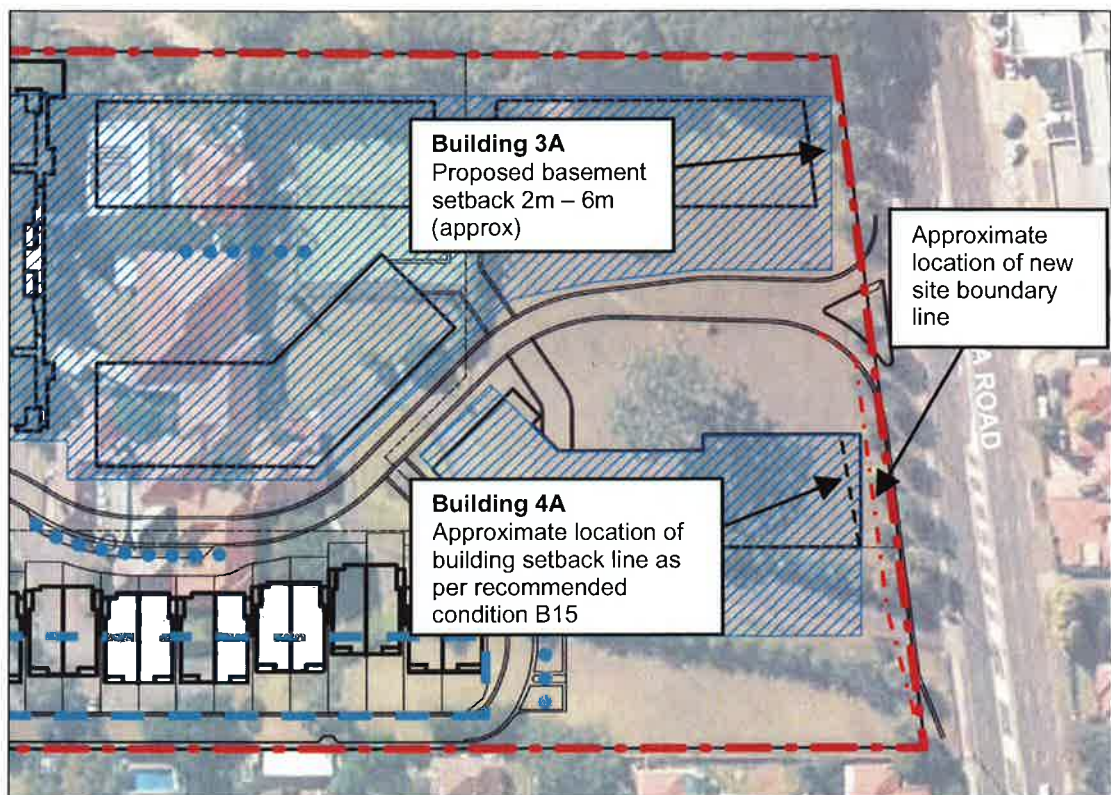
Extract from Indicative Car Parking Plan showing extent of basement areas
